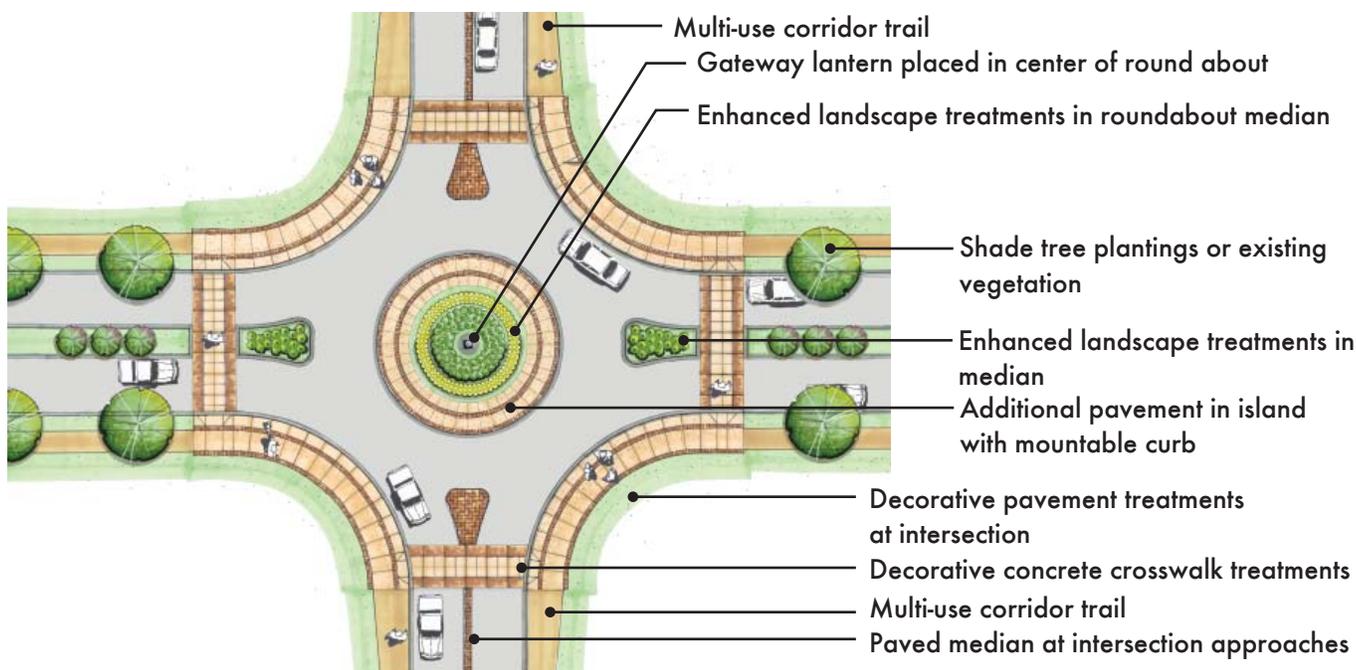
Typical plan of roundabout intersection treatments. Roundabout intersections will include similar crosswalk treatments as the primary intersections along the corridor.
